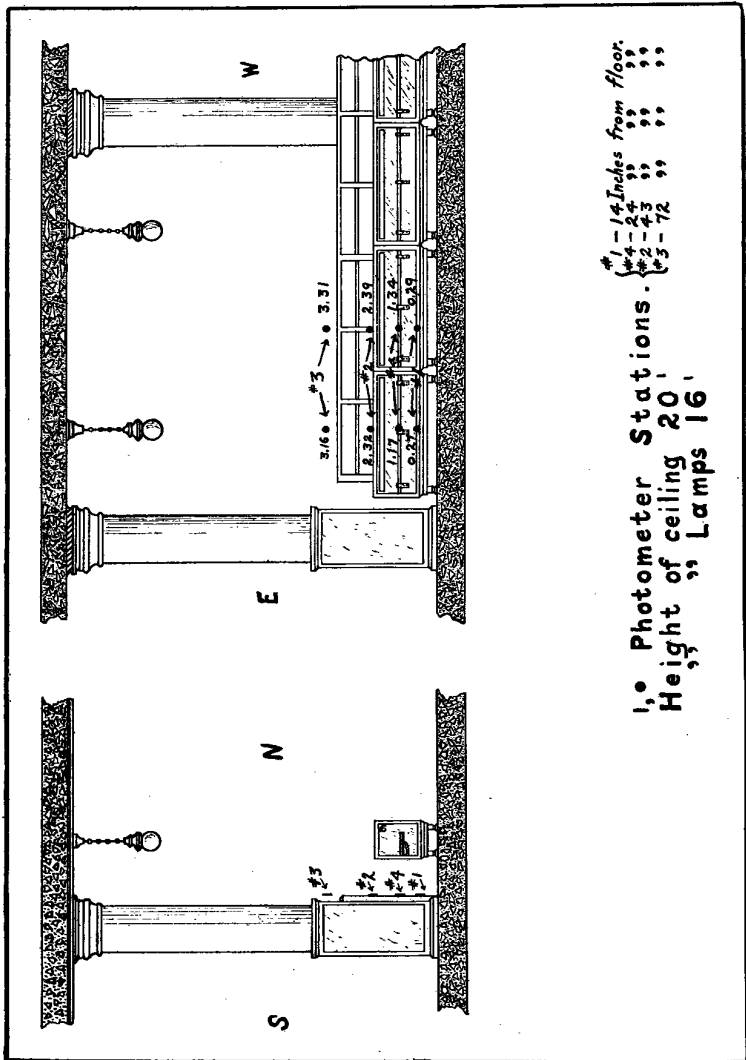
Section plan of main floor, (gentlemen's neckwear), showing location of furniture, pillars, lighting units, test stations and illumination data.
